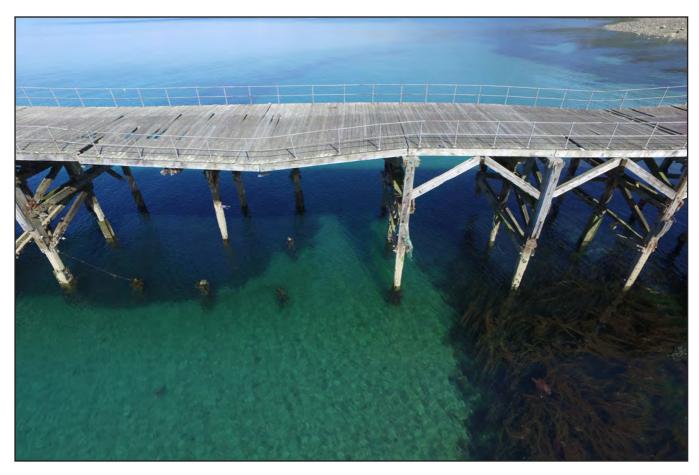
Aerial view of Trefor Pier from the east-southeast showing the condition of timber decking over collapsed trusses (Trusses 12 to 18) (UAV image: DJI_0108)
